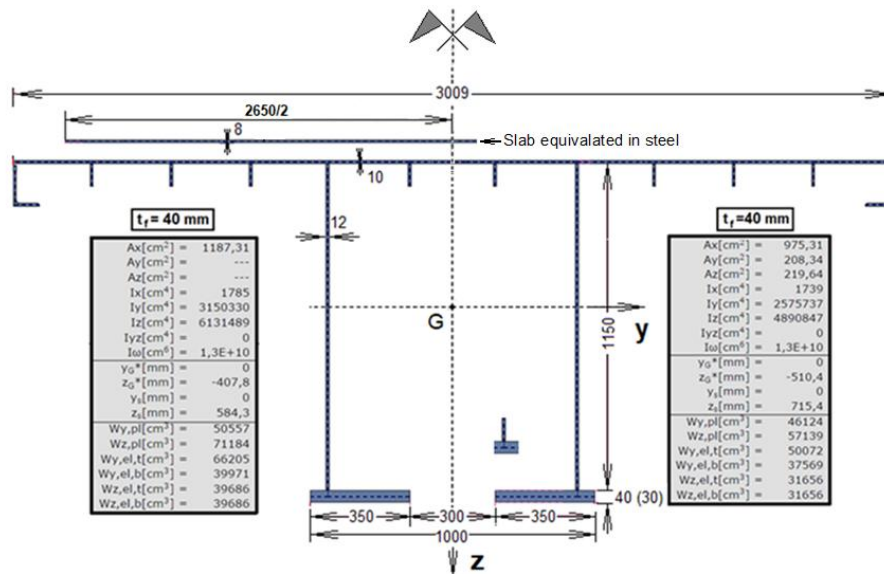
Strength characteristics of the steel girder and the composite girder equivalated as a steel girder.
